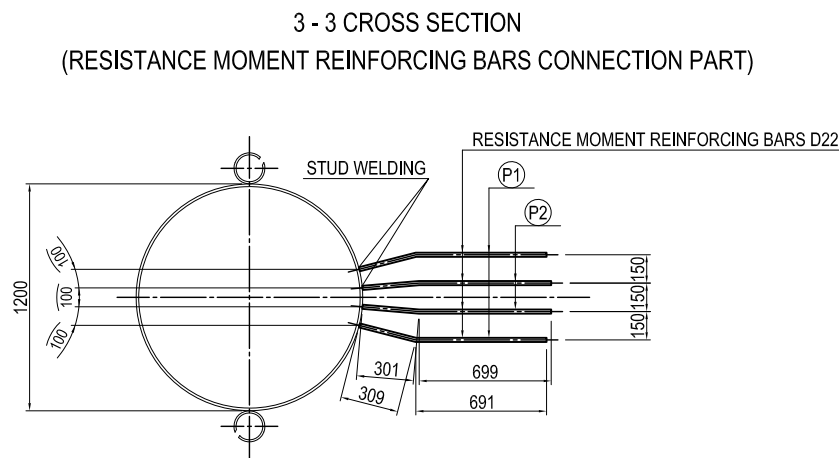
DETAIL OF CONNECTION BETWEEN STEEL PIPE SHEET PILE AND FOOTING OF P12 PIER
